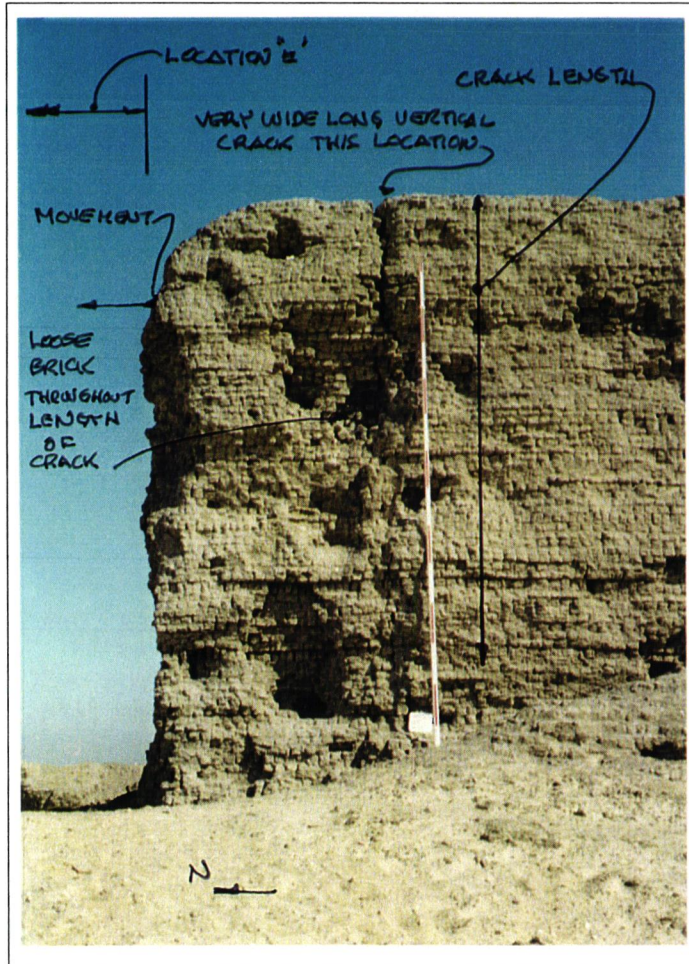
West Main Enclosure Wall Near West Entrance
